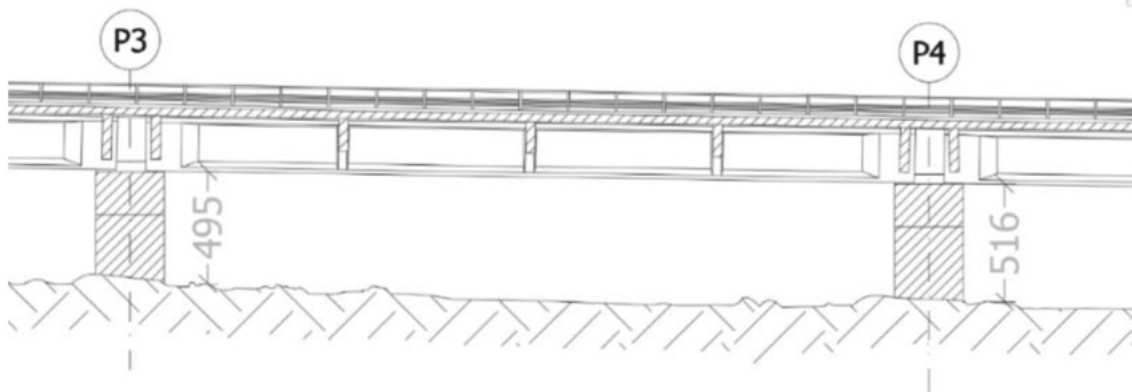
| Longitudinal elevation of a typical span between piers P3 and P4.
